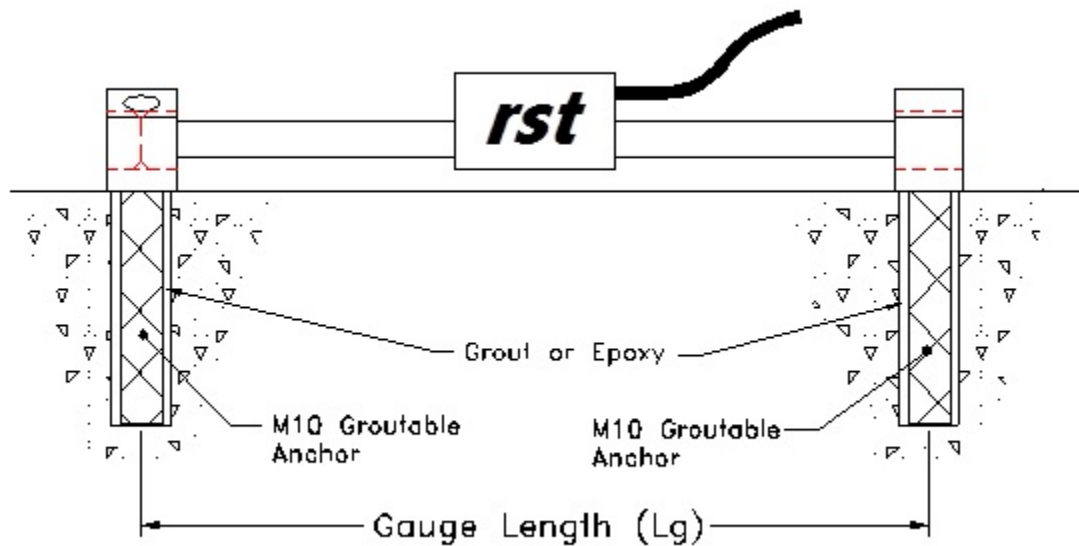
INSTALLATION ON CONCRETE USING GROUTABLE ANCHORS
